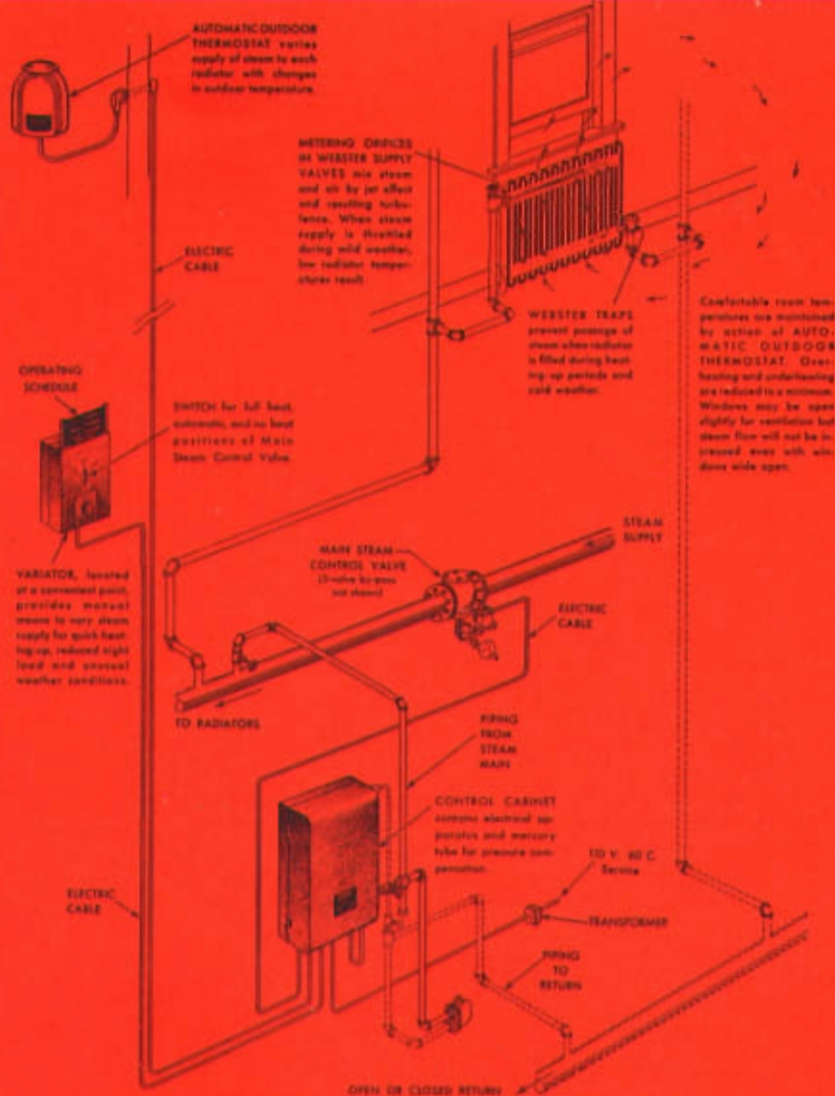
Standard Arrangement of Webster Moderator System Using a Single Main Steam Control Valve
